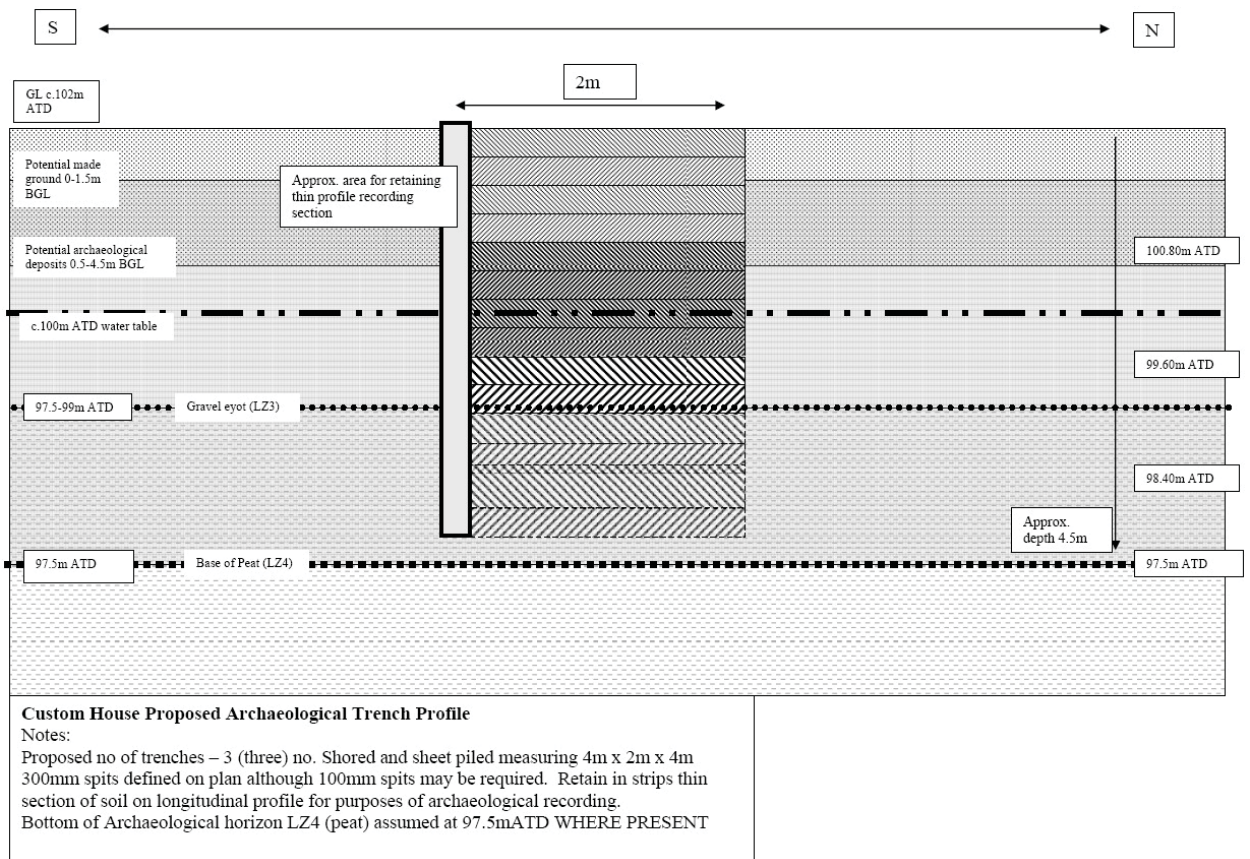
Proposed excavation method for Archaeological Evaluation trial trenches
